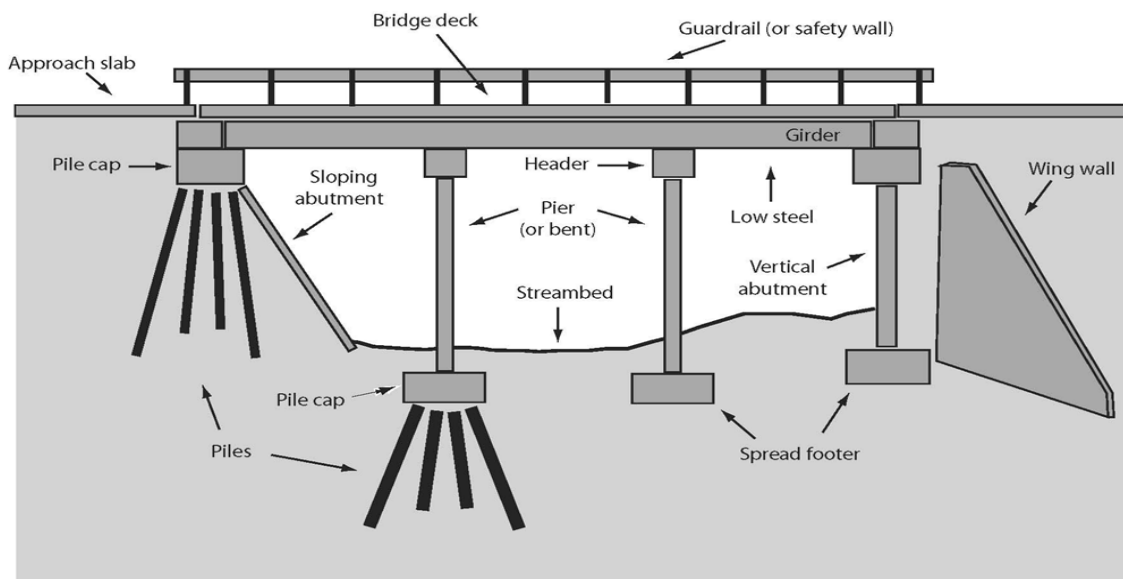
Bridge (General) Components (Source: www.civilarc.com)
